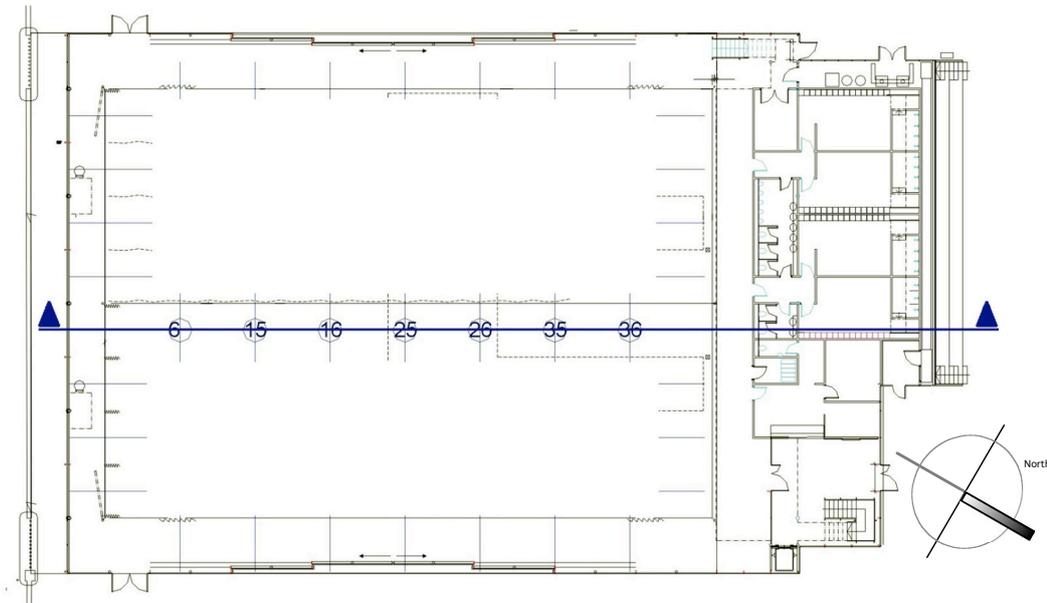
Plan of the building showing the section taken for Figure 7-1
